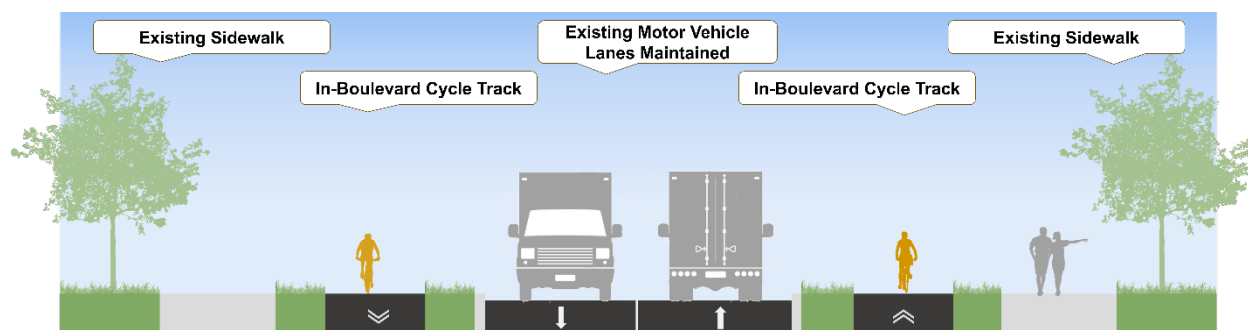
Illustration showing the typical York Gate Boulevard proposed design showing cycle tracks added to the boulevard at sidewalk level and no roadway changes.
